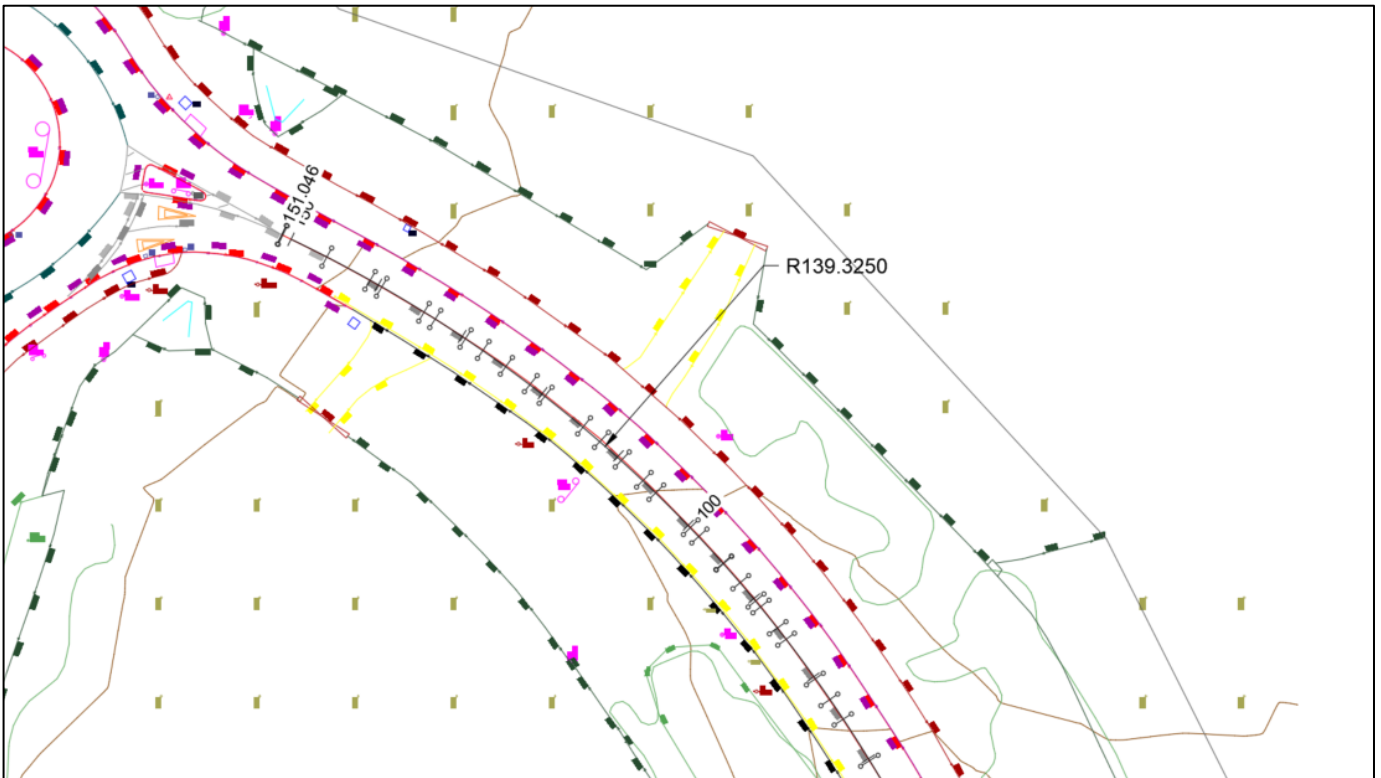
Horizontal Alignment of L1043 Killickabawn Road
